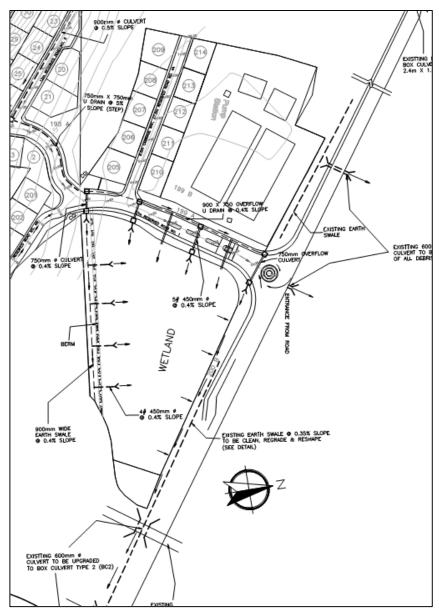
Storm water layout for Alternative B for the proposed Dundee development
